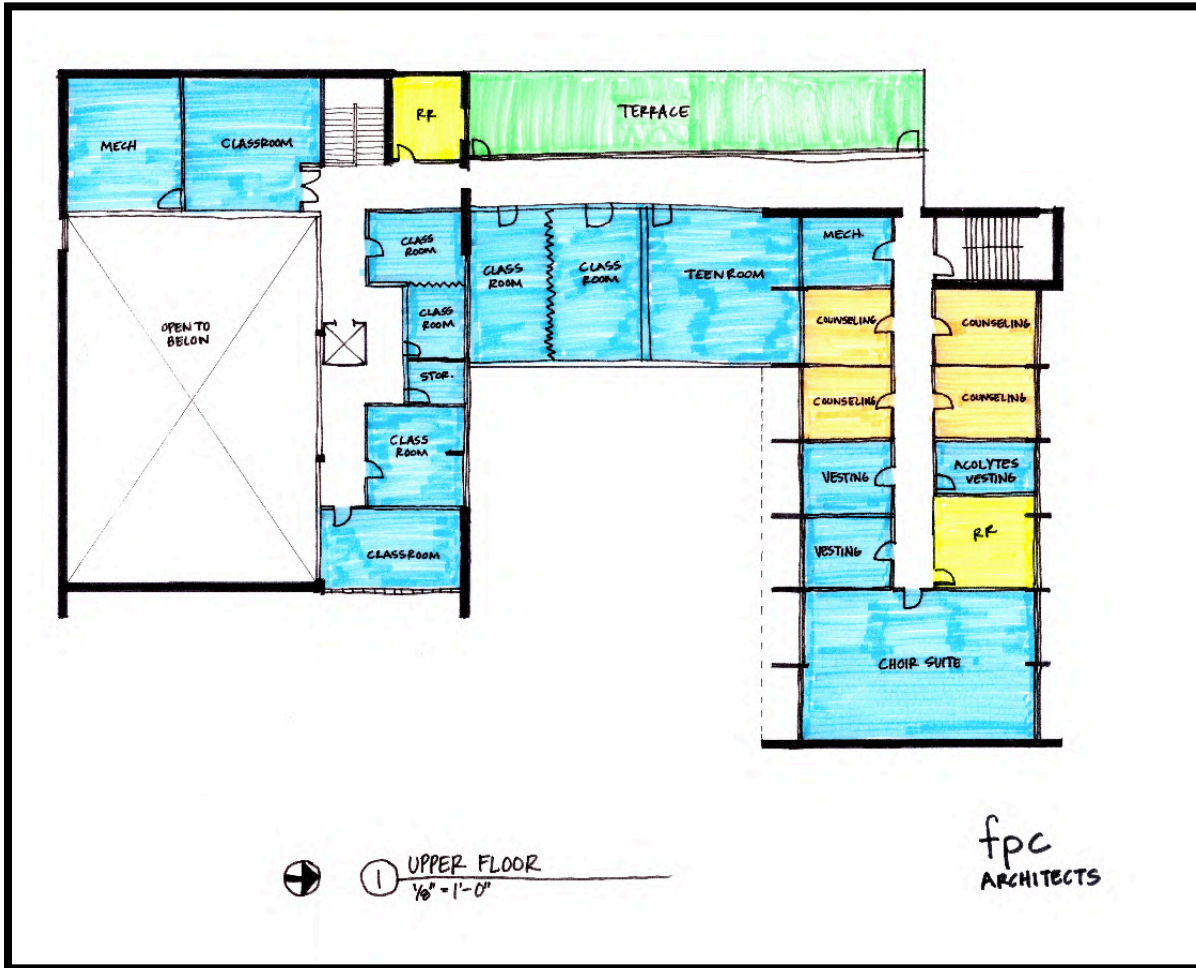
Team #3's proposed upper floor of Gregg House, with a single-loaded enclosed corridor that connects the north and south wings of Gregg House while also providing access to a rooftop terrace that faces the site's churchyard.
